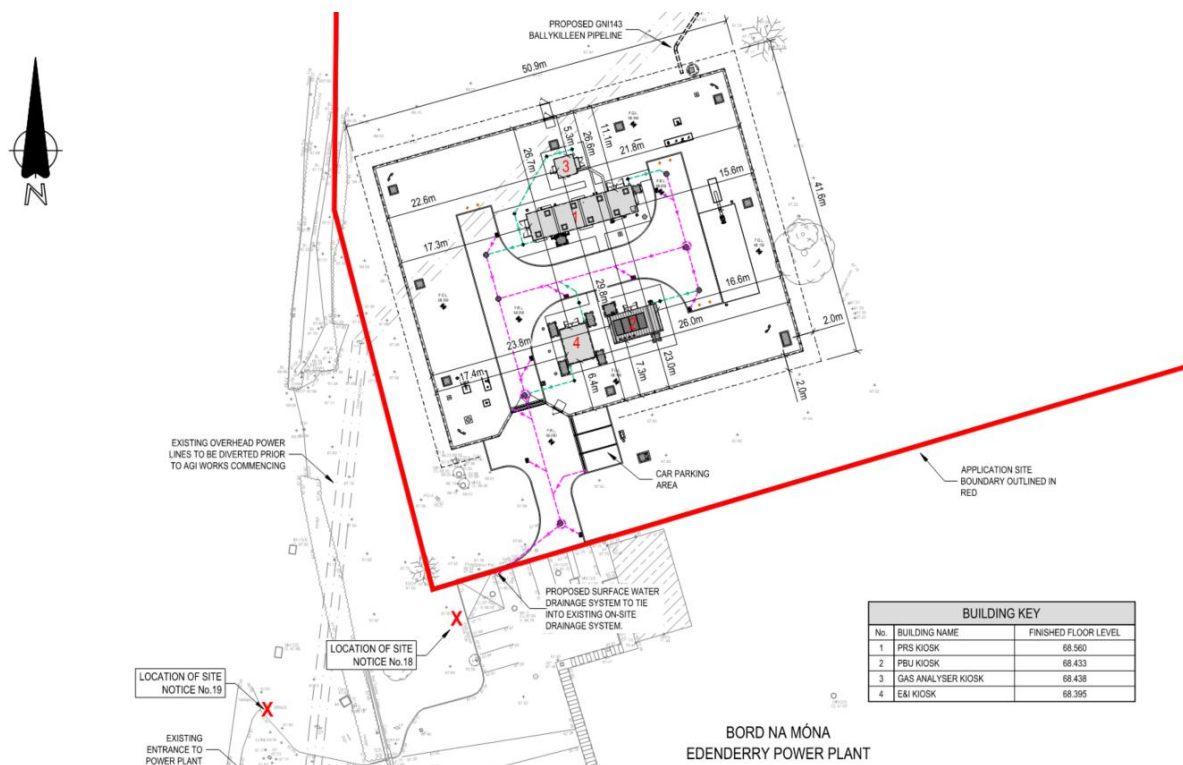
14303-GNI-01-PL-SLA-0001-01 Site Layout Plan Containing the Elements Discussed in Section 3.3.2 and 3.3.3
